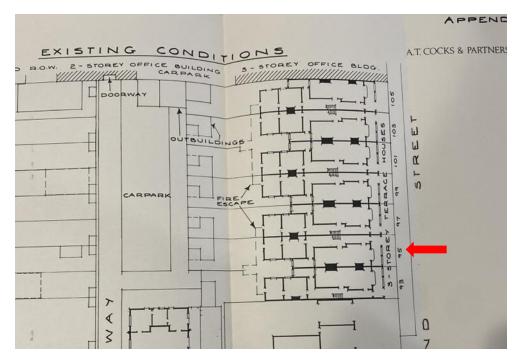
Ground plan of Drummond Terrace, c. 1986, with the subject site indicated. The middle fireplaces are inaccurately shown on the south wall instead of the west wall Source: Anglican Diocese of Melbourne Archives
